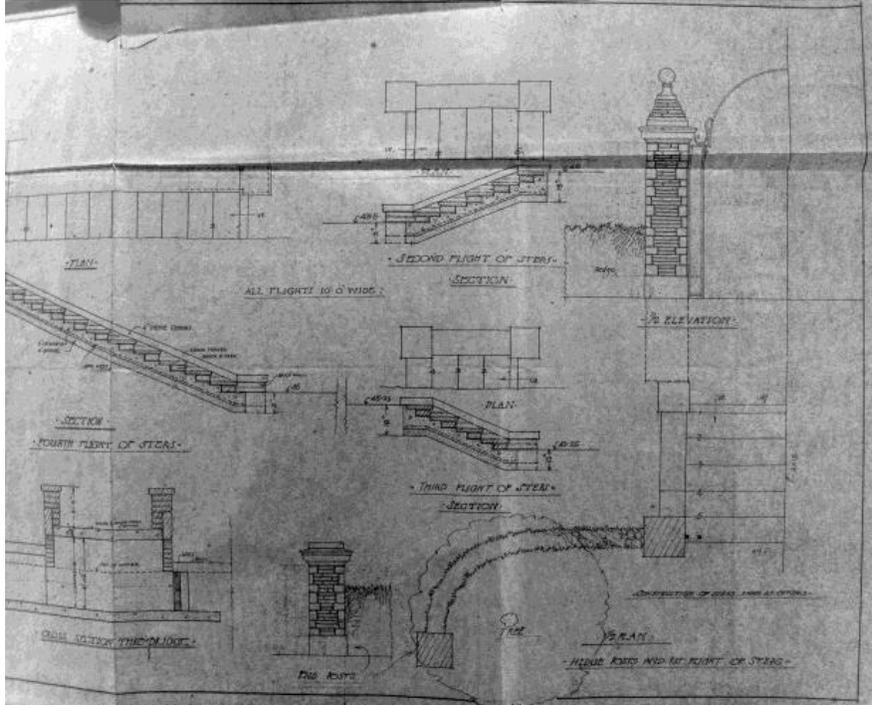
Details of the wall design, stairs, and brick pillars (University of Guelph, Dunnington Grubb Fonds)
